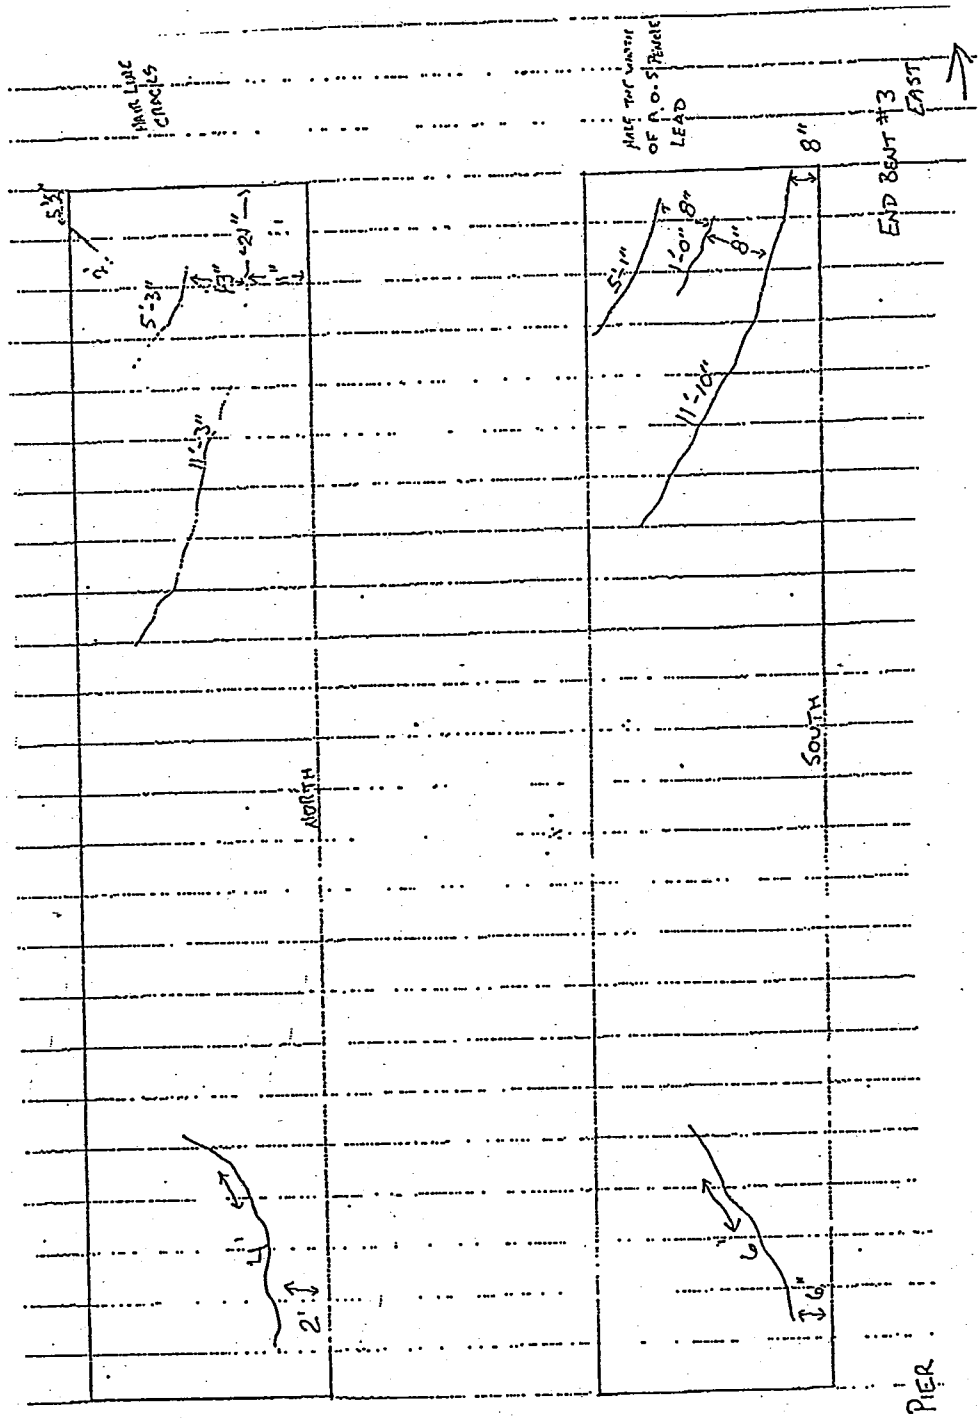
Crack of South Exterior Girder over I-75 NB
